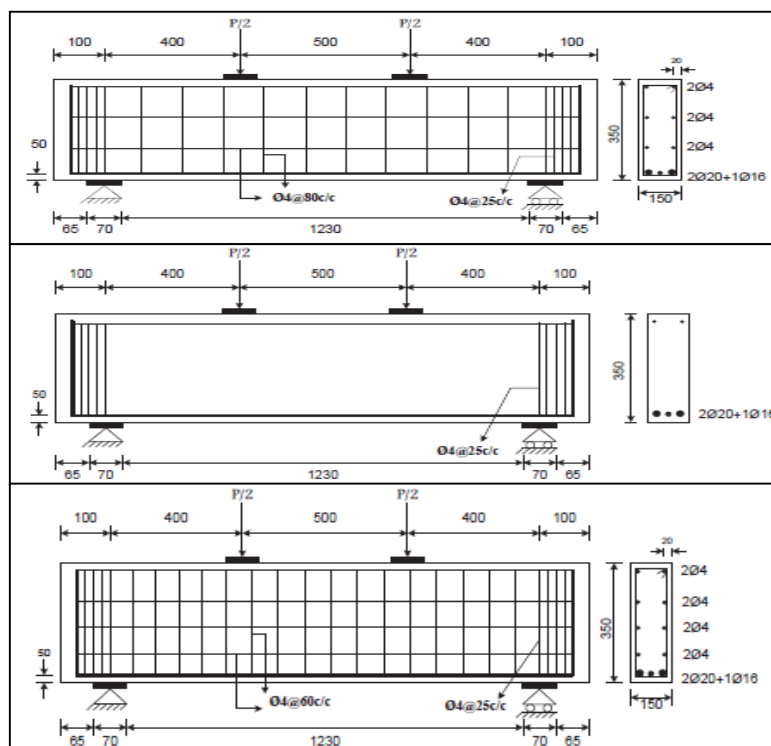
Details and dimensions of the tested specimen and loading [49].
